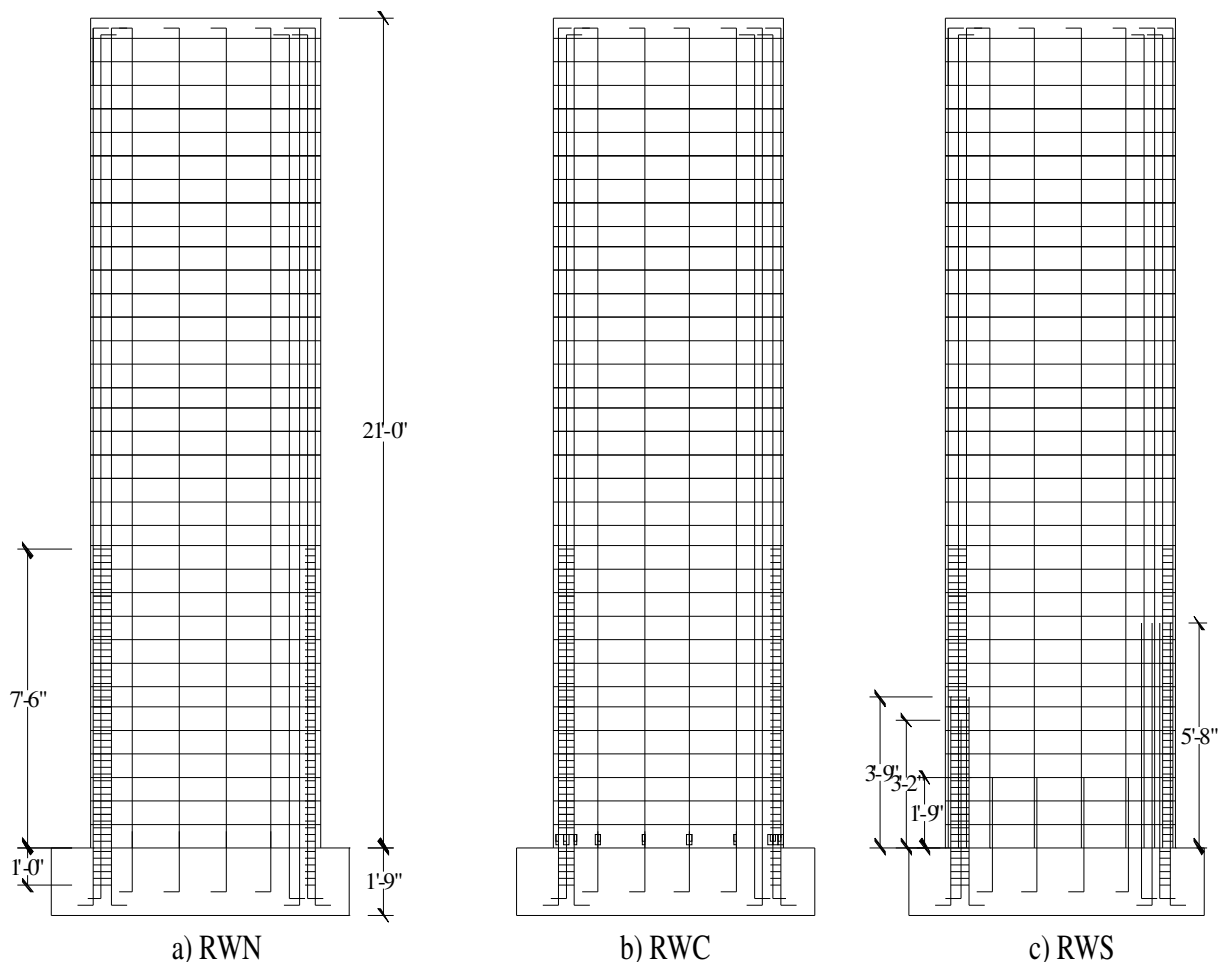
Reinforcement details along the wall height in the rectangular walls
